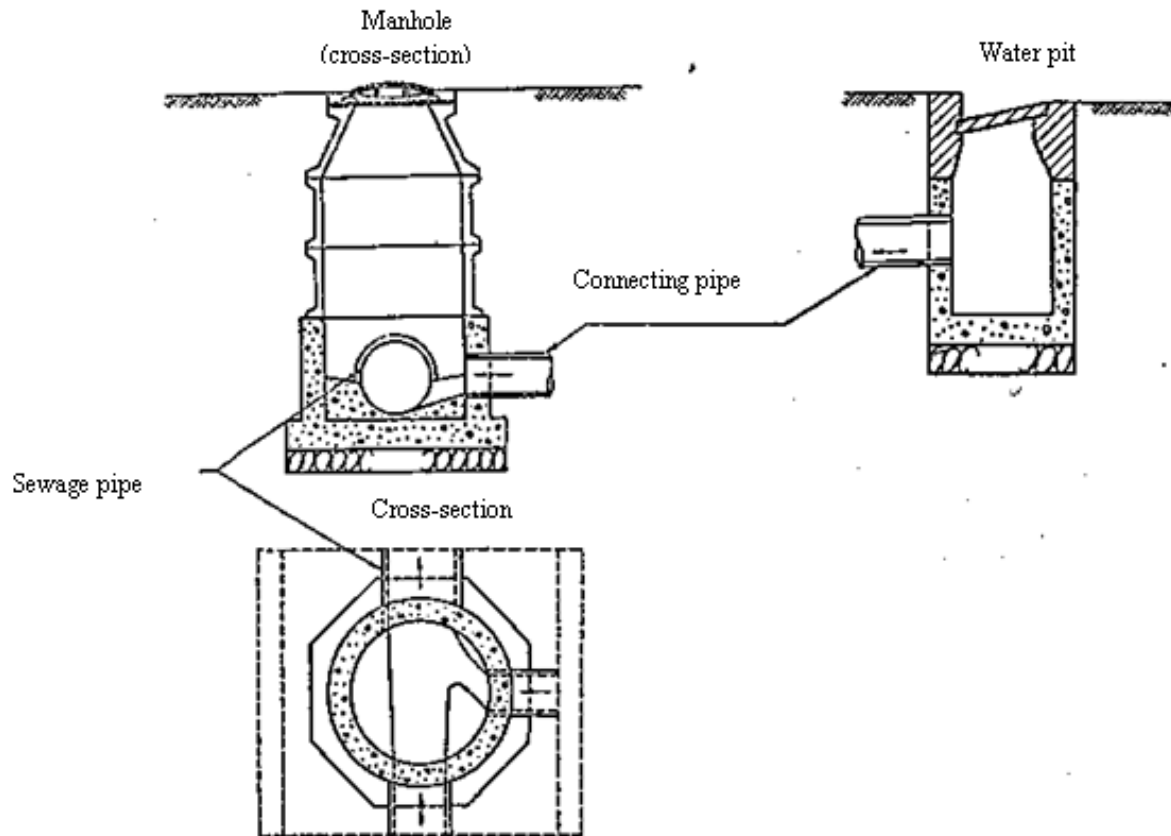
Waste water pipe, connecting pipe, and manholes
